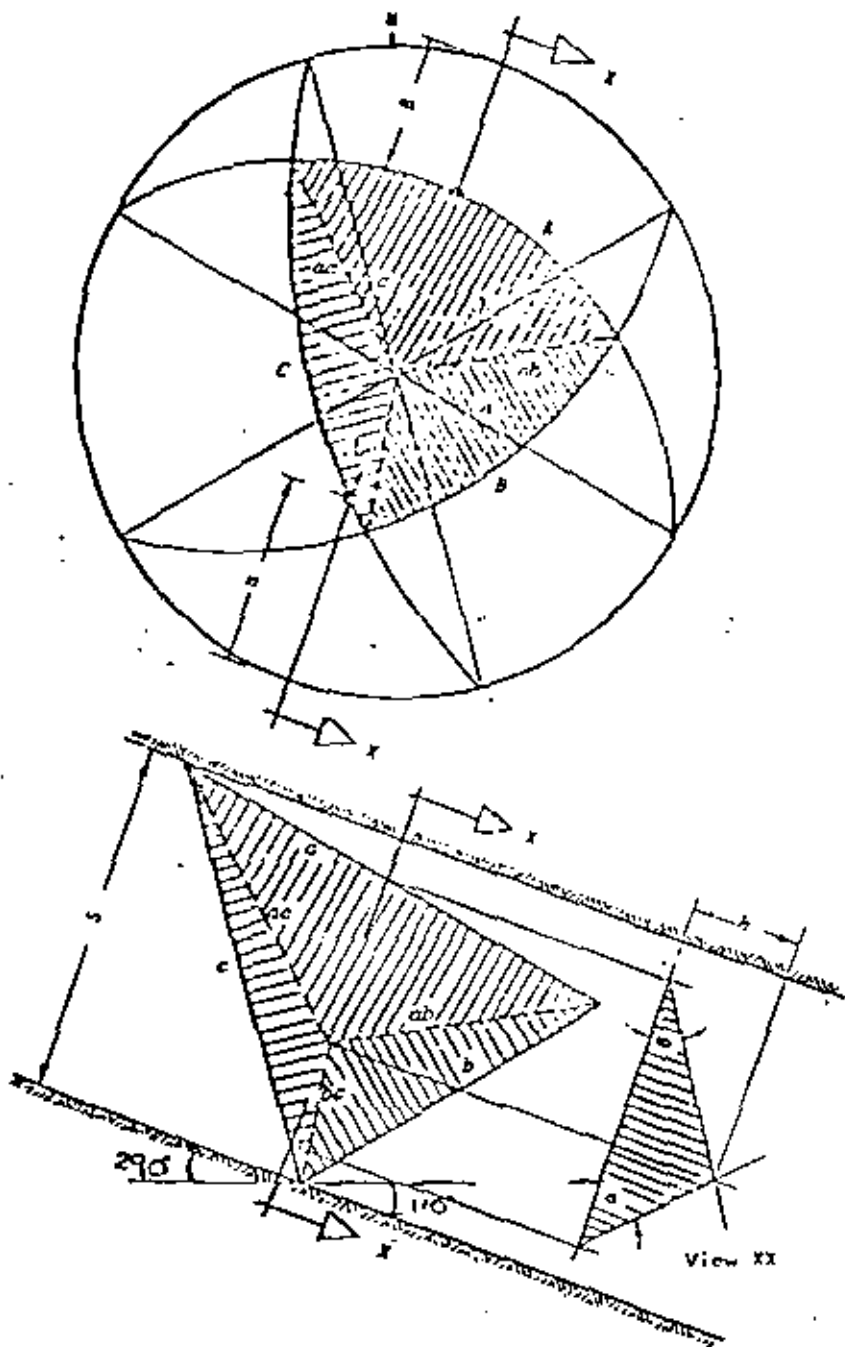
Supplementary construction in conjunction with a stereographic projection for the determination of the shape and volume of a structurally defined wedge in the roof of a tunnel.
